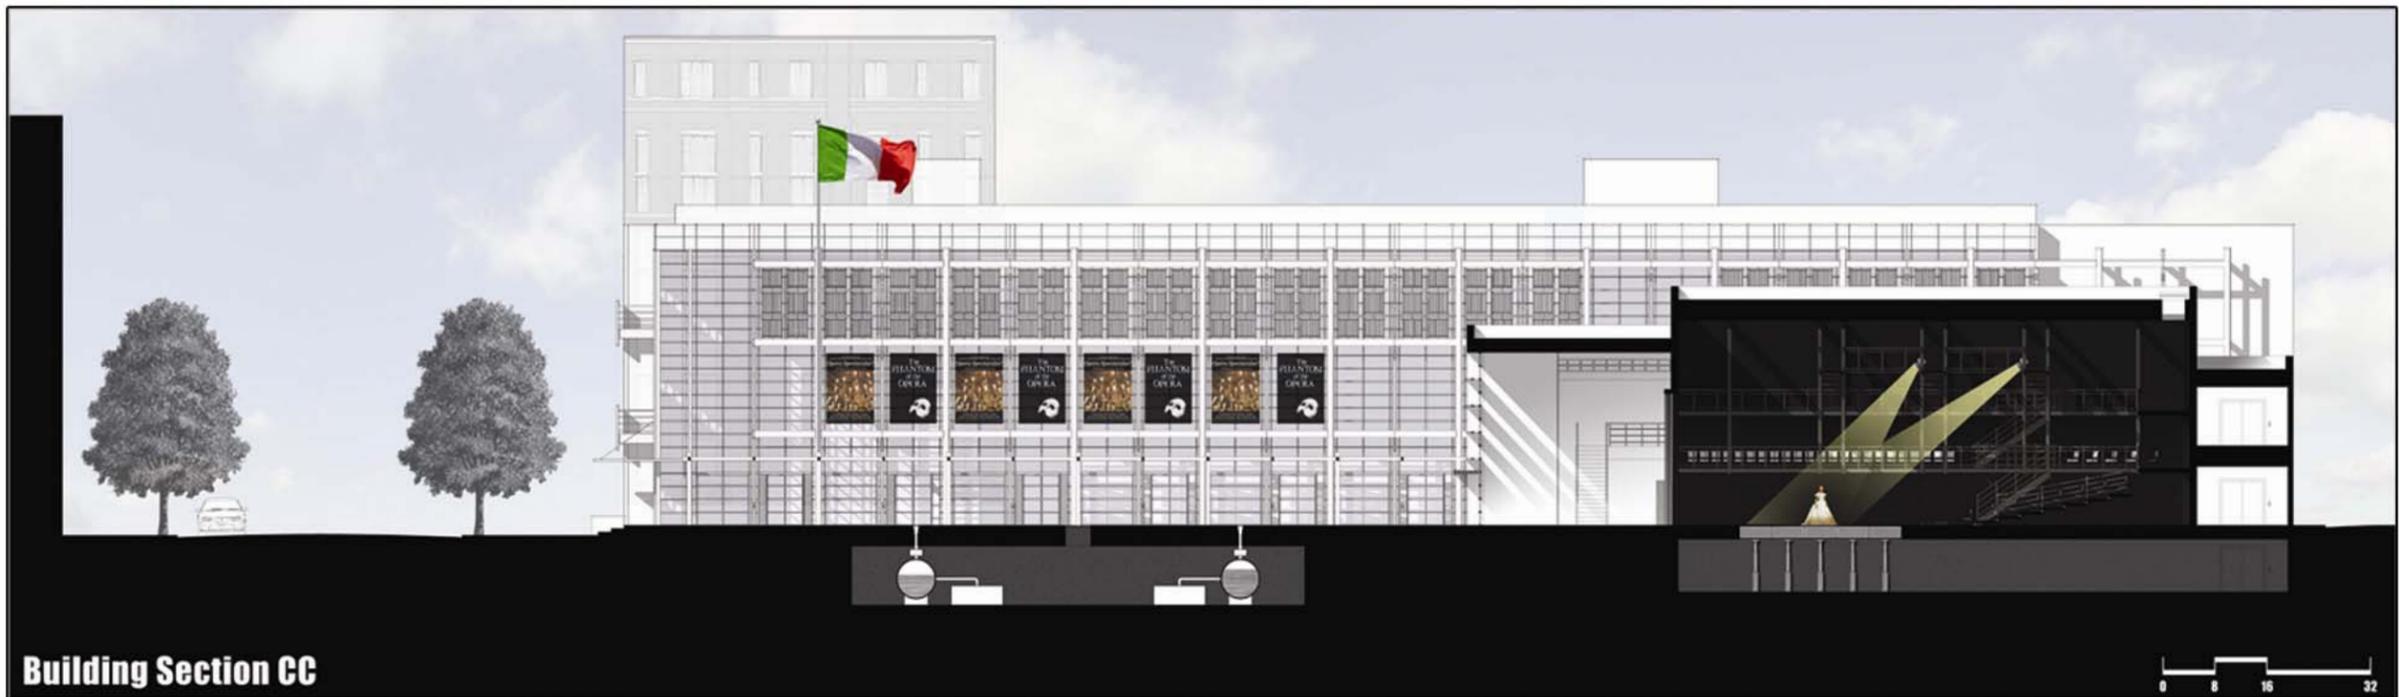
Building Sections, Carabram, Brampton, Ontario, Canada
